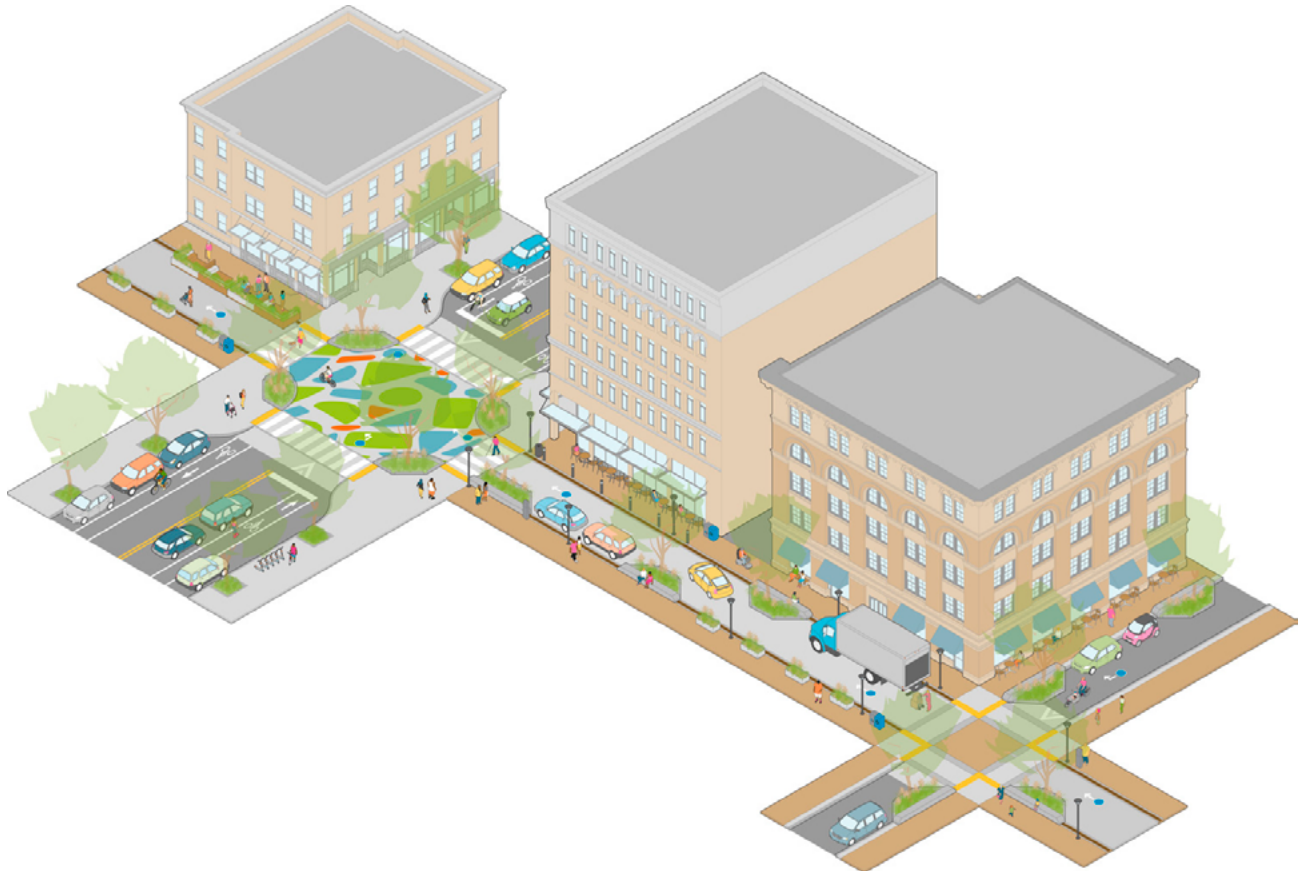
Example of Shared (left) and Curbless Street (right) Intersections (Source: Toole Design)
